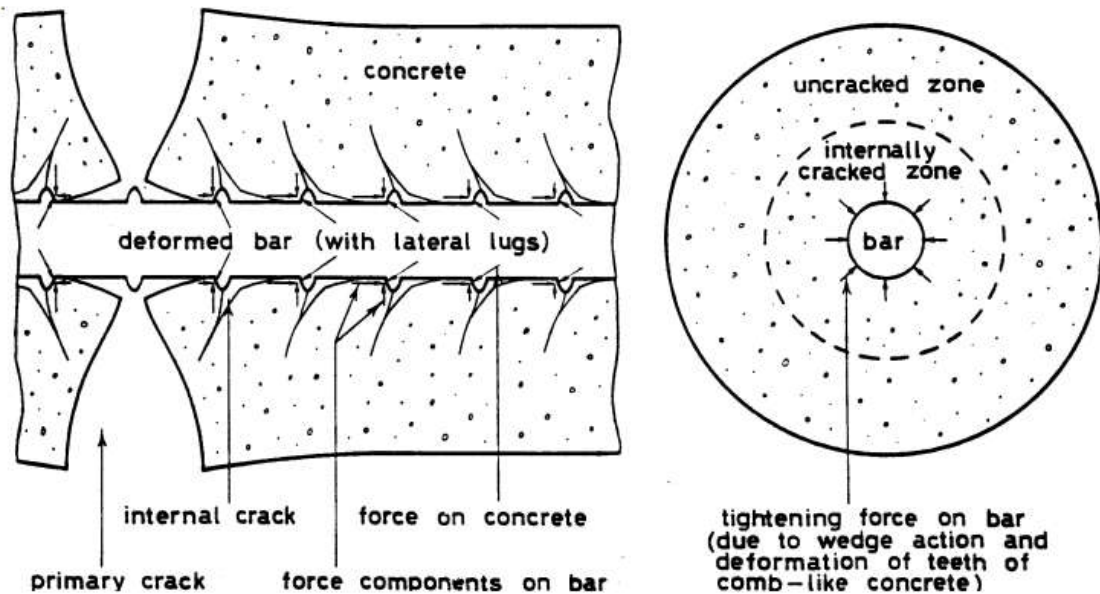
Cracking of Reinforced Concrete (Goto, 1971)
